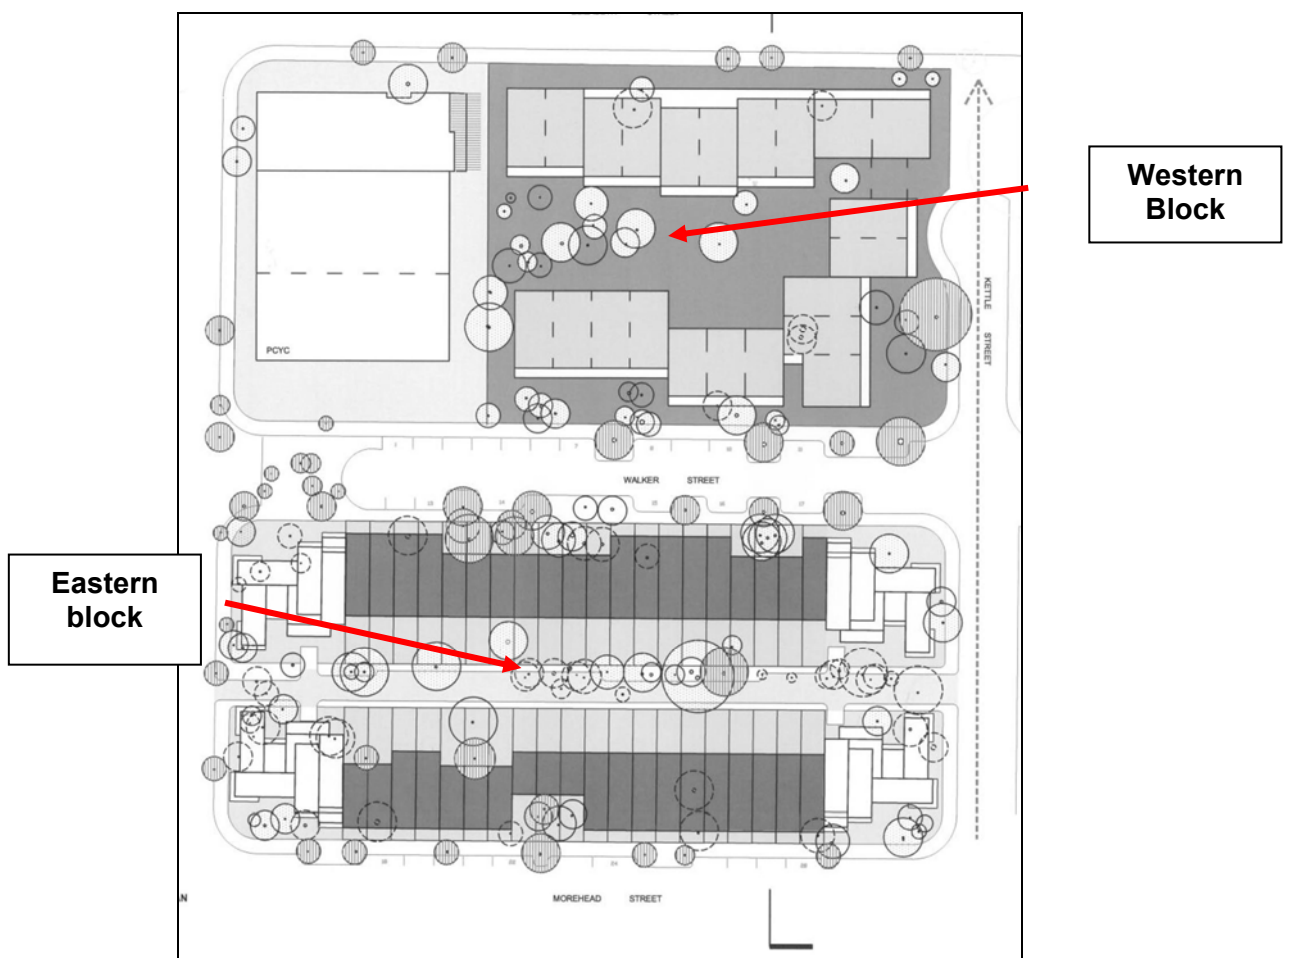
Approved 2003 master plan site layout for eastern and western blocks
